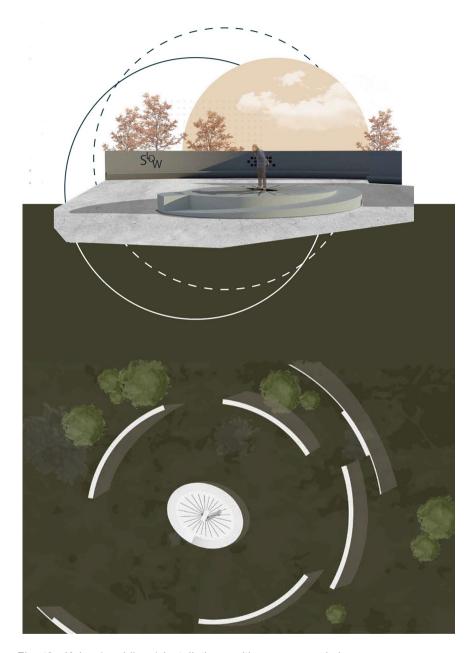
Kalpa (meridiana) Installation – with a person and plan
